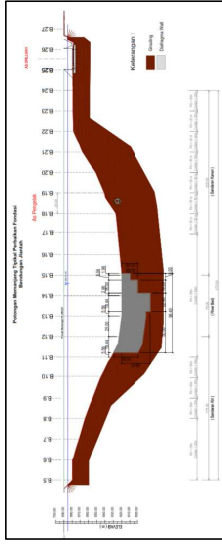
foundation improvement on dam foundation using diaphragm walls and grouting
